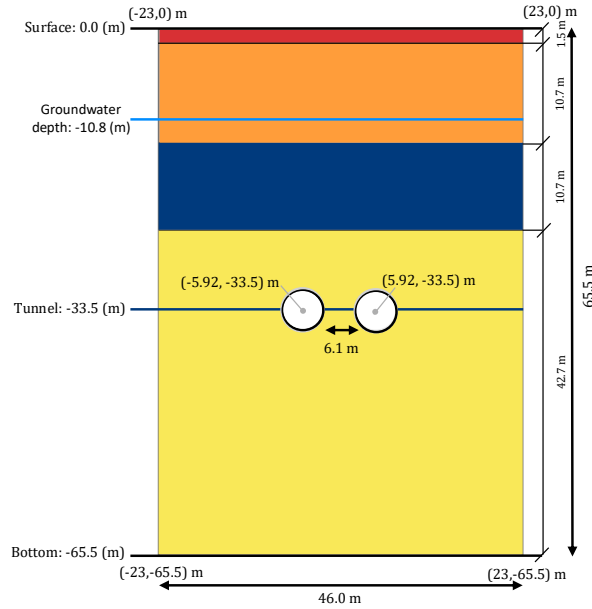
Cross-section of model, showcasing the various strata and twin tunnels.
